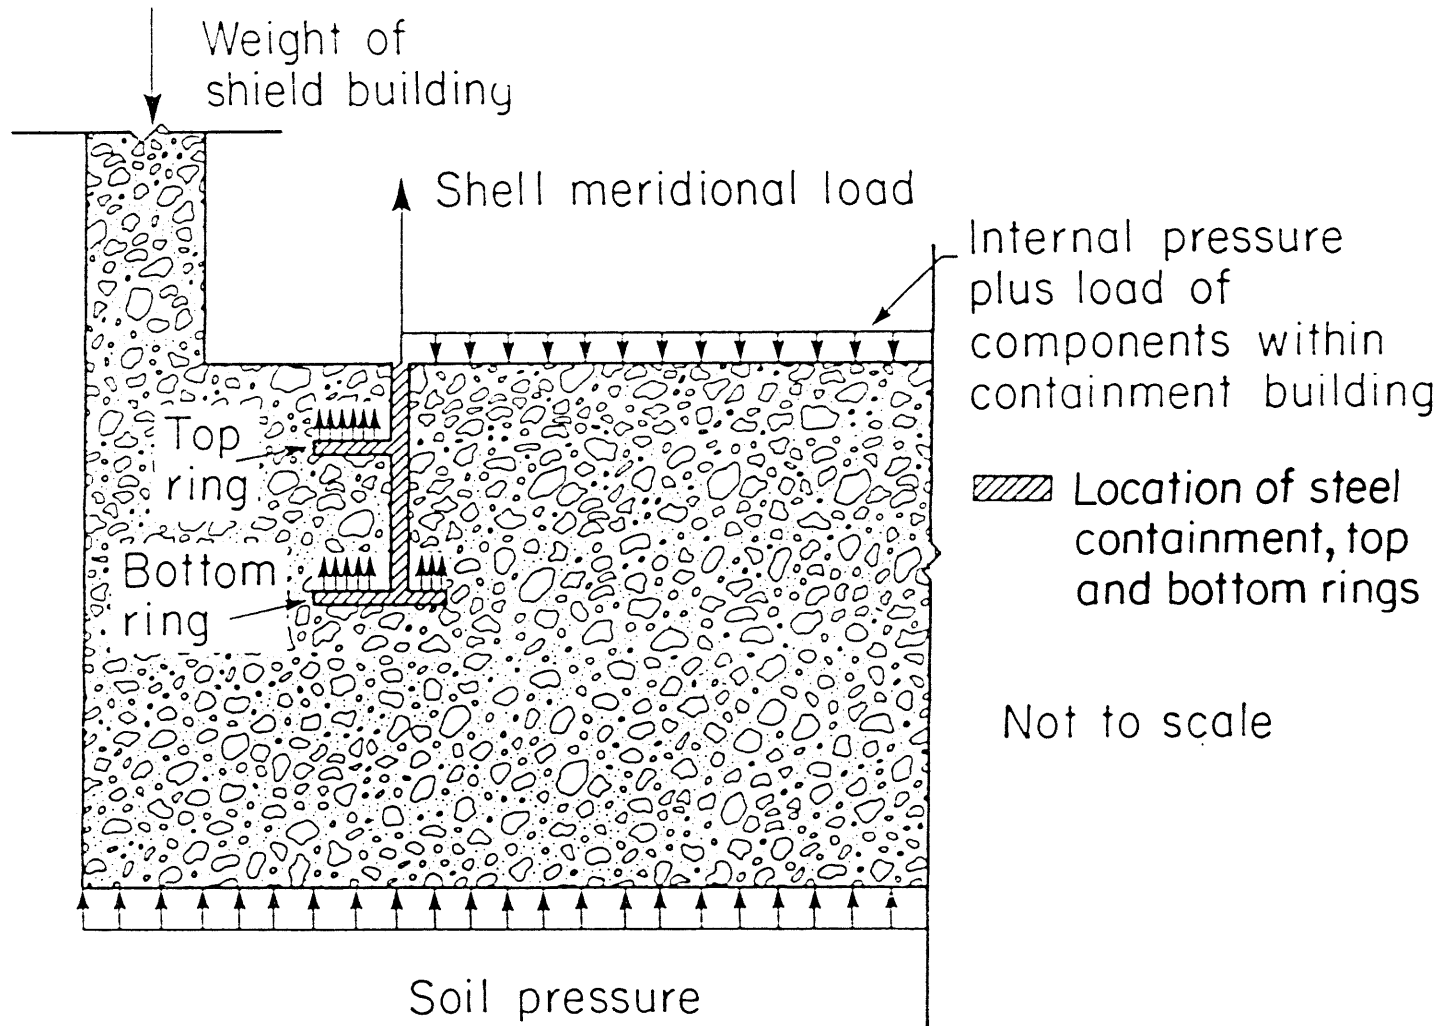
Schematic Showing the Built-in Crack in Containment Basemat Near the Containment Anchorage System
